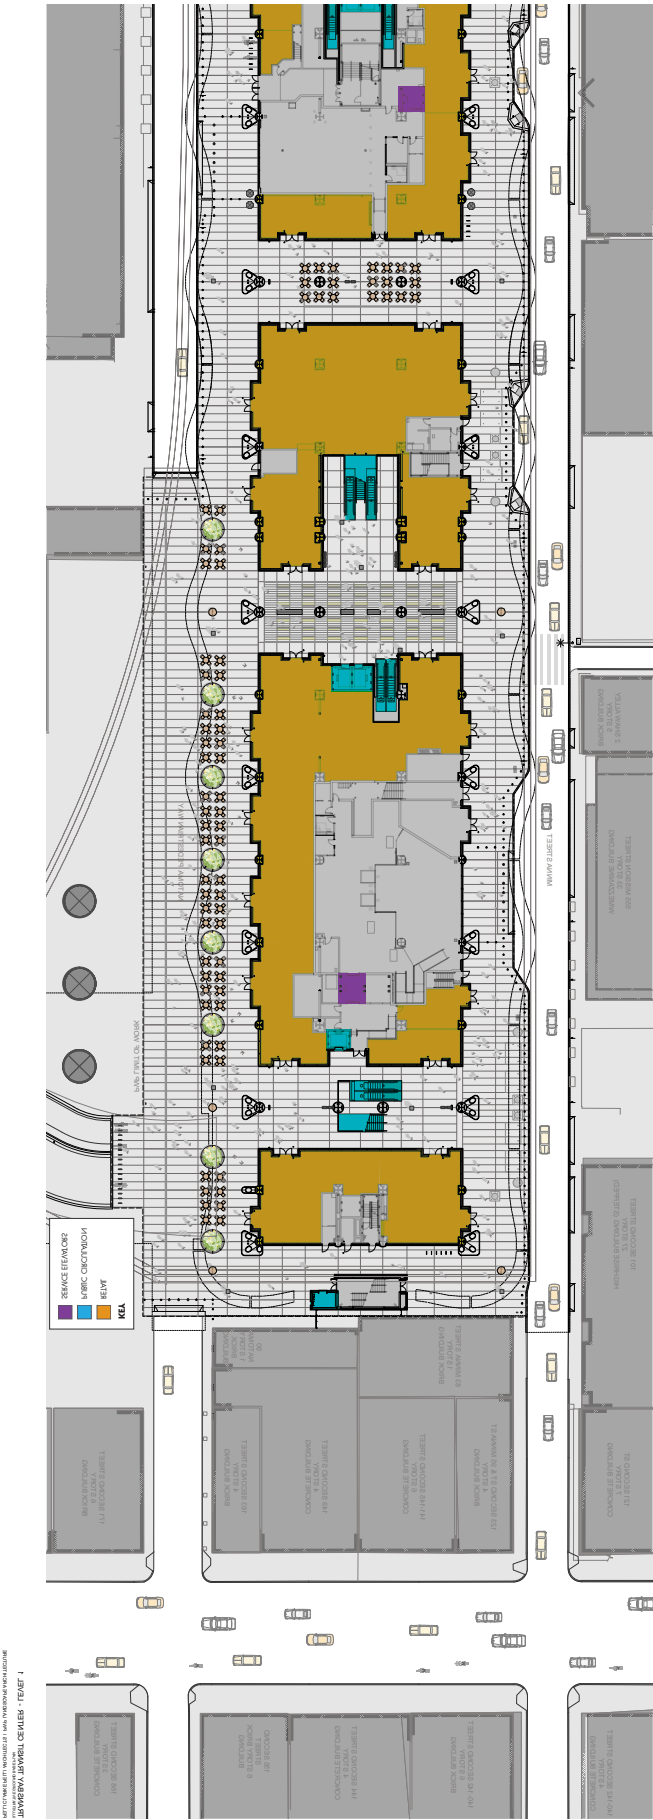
Illustrative Ground Floor Plan - East Side Detail
